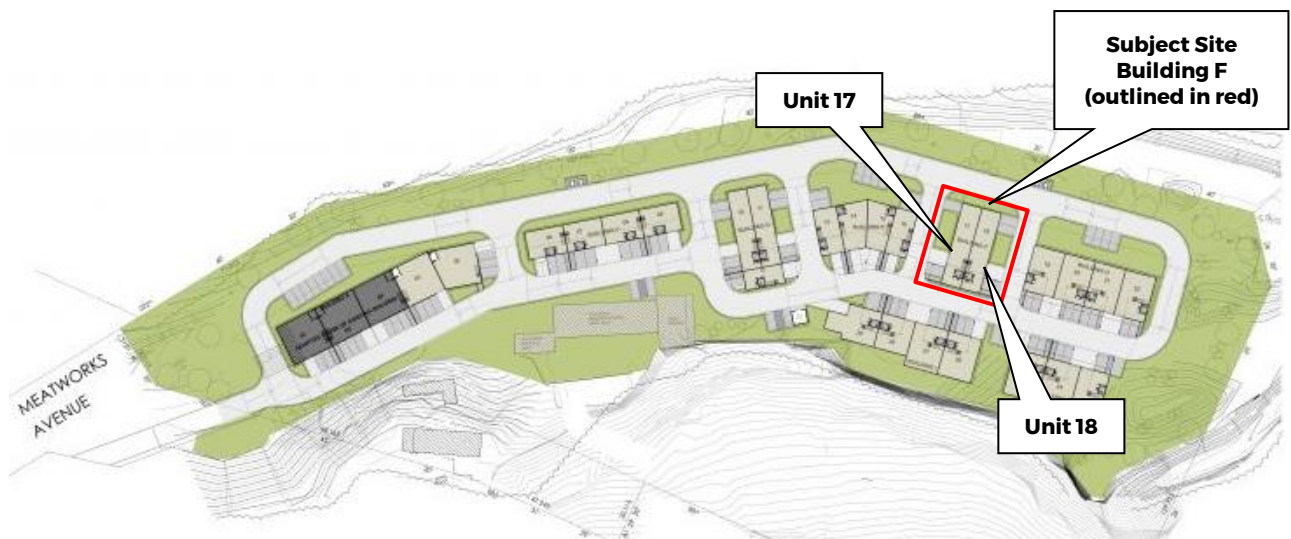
Approved Floor Plan under DA2011/0985, prepared by Gelder Architects; Unit 17 and 18 (outlined in red)
